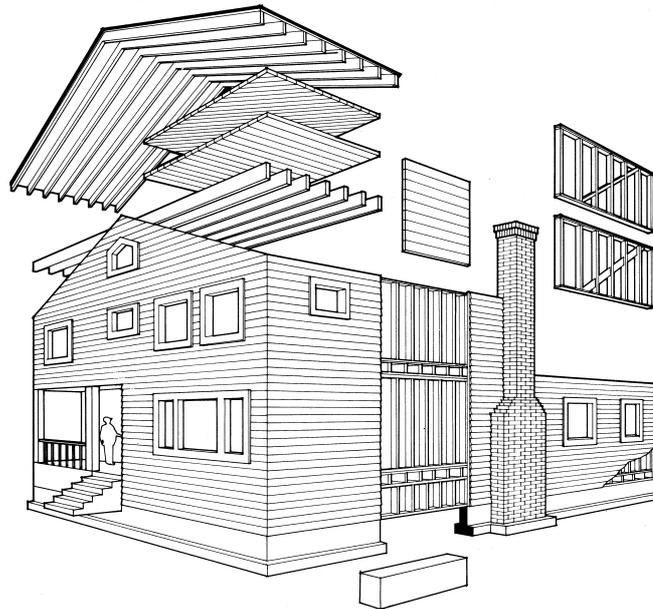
Exploded view of typical pre-1940 California single-family wood-frame dwelling showing typical structural systems. Floor and roof systems typically consist of wood joists and rafters and diagonal or straight sheathing; wall systems consist of stud walls and horizontal siding; and foundation systems consist of unbraced cripple walls, unbolted sill plates, and concrete or masonry foundations. Masonry chimneys are typically unreinforced and water heaters are typically not braced [from Lagorio, Freedman and Wong, 1986].
